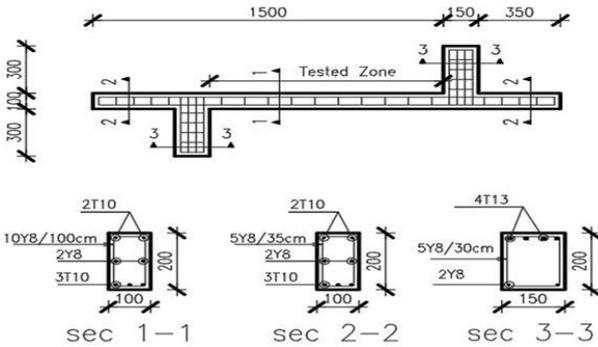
Geometry, beam reinforcement and sections details of verification model, Khaled [16].
